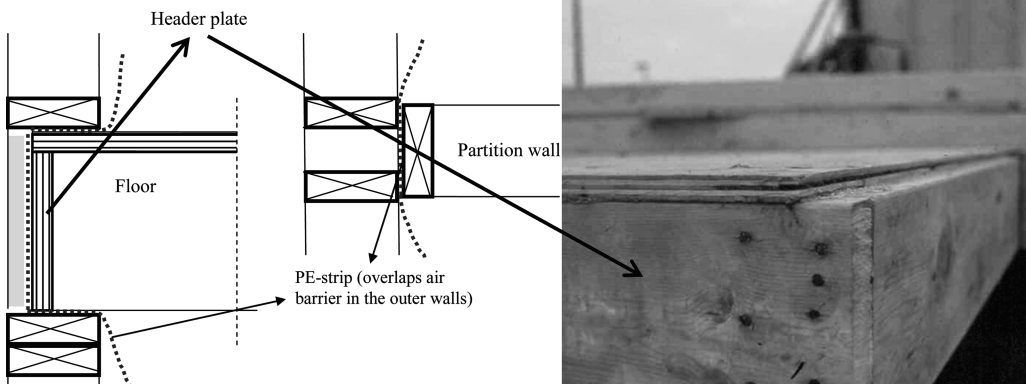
Timber-framed construction: caring for a continuous air barrier in the envelope.
